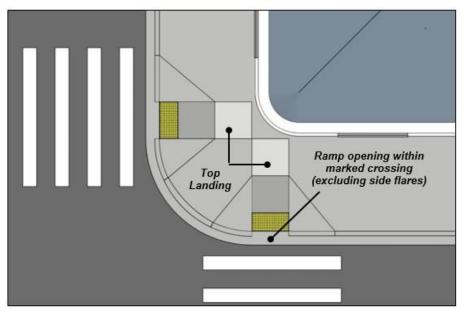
Example of ADA Compliant Curb Ramps at Intersections (Source: U.S. Access Board)
